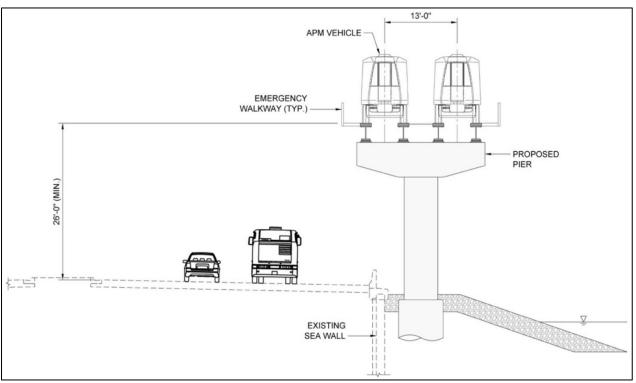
APM Bay Crossing Trunkline Typical Section
